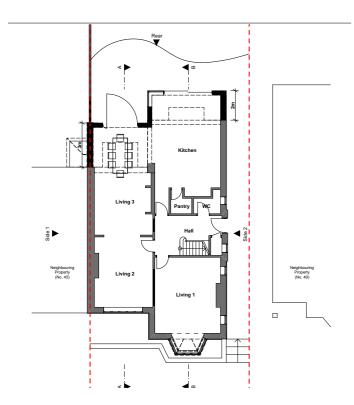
Proposed Ground Floor Plan - 47 West Heath
